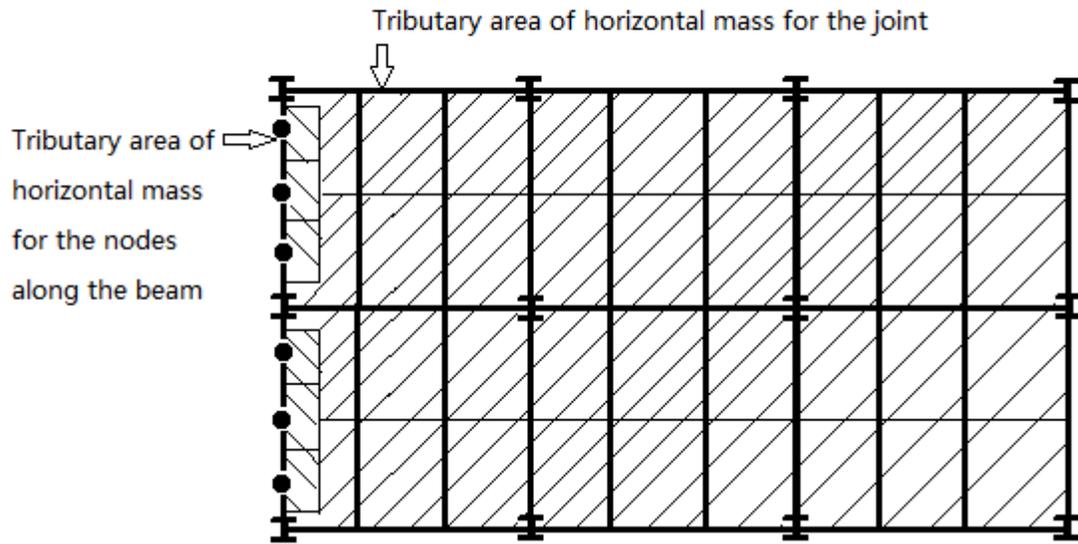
Detail of Tributary Area of Horizontal Mass in the Moment Frame as Beam Model (two bays)
